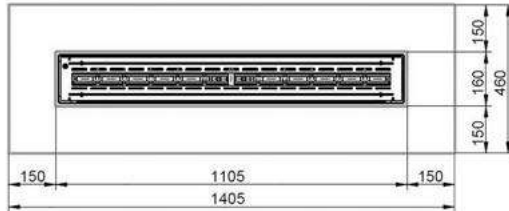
Minimum dimensions of top / table plate on Quadra Inside Automatic II with frame
